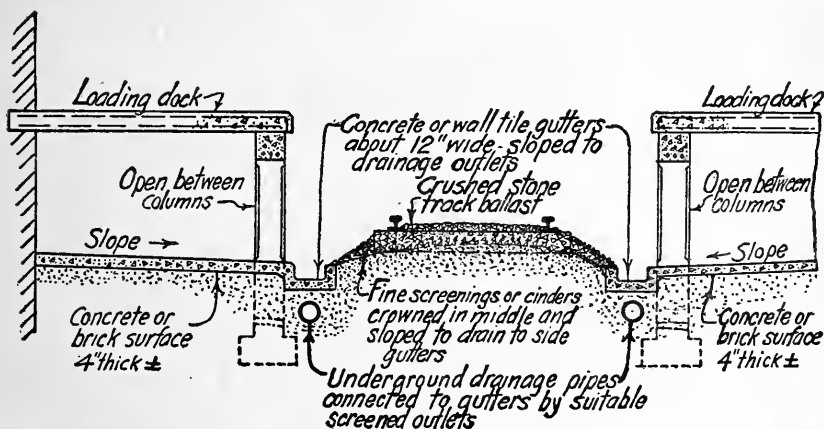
Railroad loading track and dock with open side, crushed-stone track ballast, and concrete or wall tile gutters.
